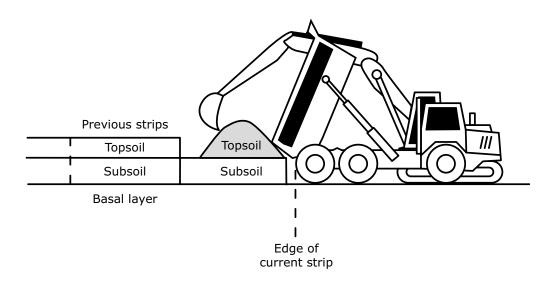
Soil replacement with excavators - dump trucks: Topsoil layer.
